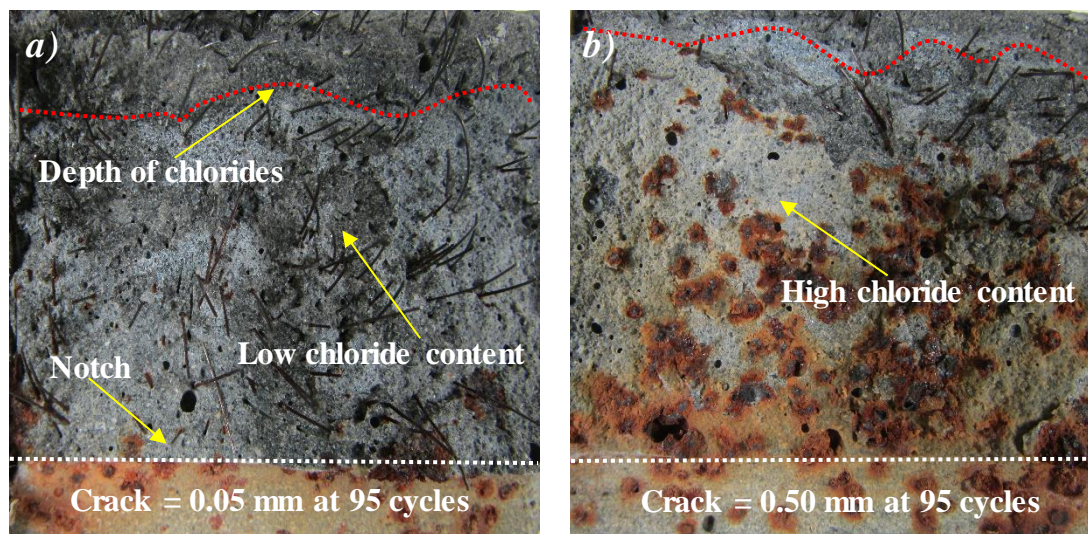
Chlorides and corrosion in the cracks at 95 cycles for specimens with crack width a) 0.05 mm and b) 0.50 mm.
